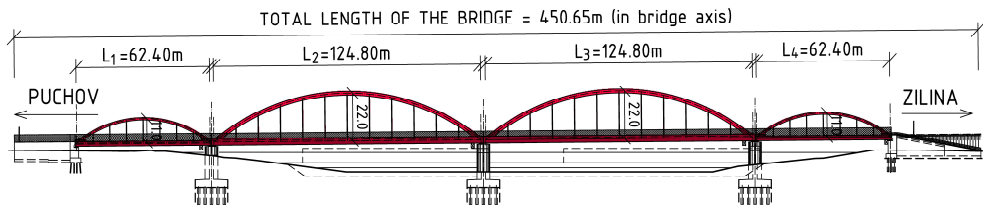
Longitudinal view of the bridge over the Nosický Water Canal.
